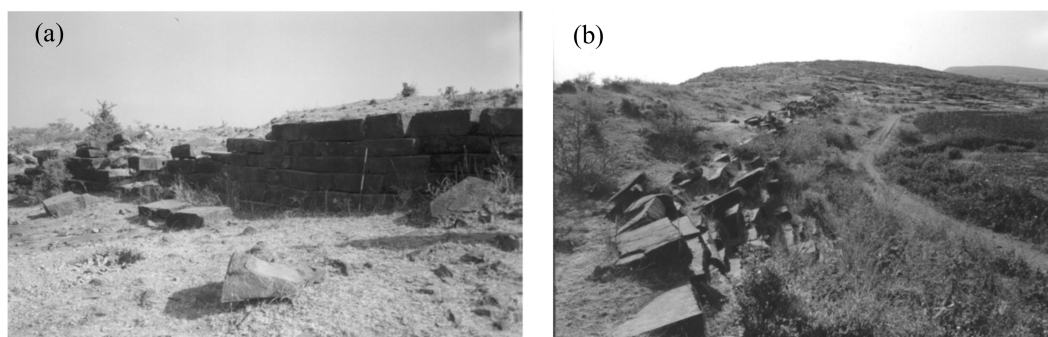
Devrajpur Dam: (a) horizontally laid dam facing; and (b) interlocked stone facing (adapted from [73]).
